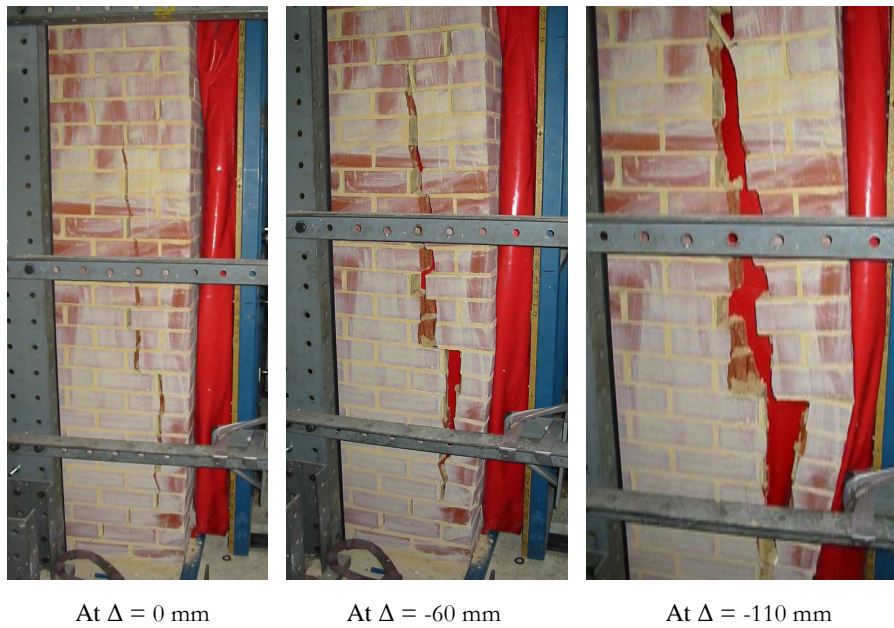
Wall approaching instability with increasing outward displacement after loss of vertical edge support due to excessive line failure. Wall s3 shown, at the far end from the window.
